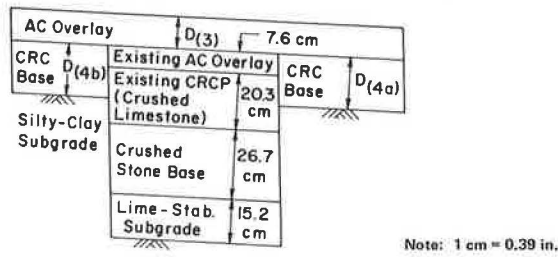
Cross section of CRCP structure on I-410 leg of the project after reconstruction.
